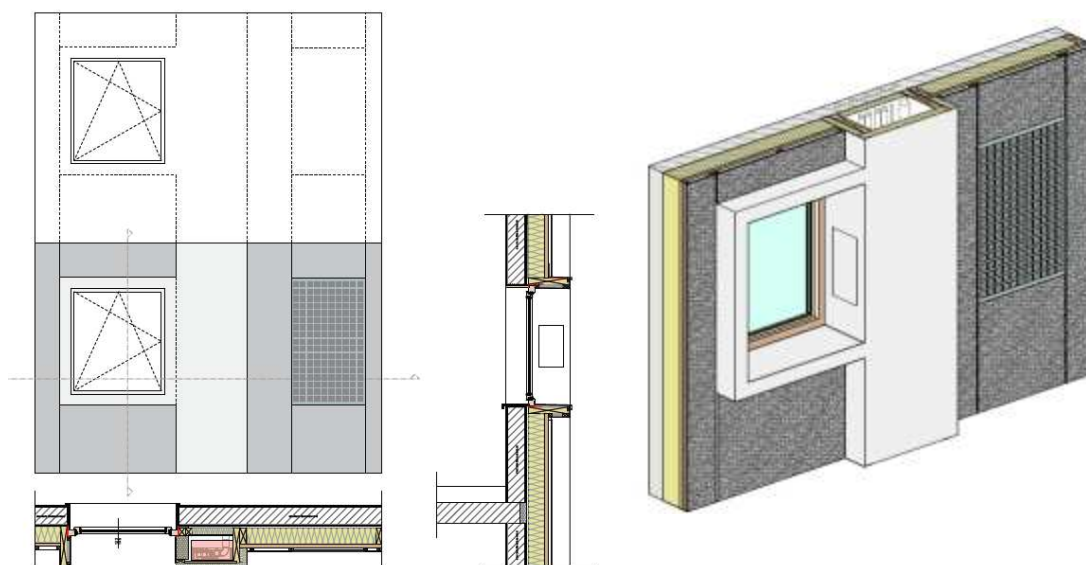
Schematic representation of a curtain wall façade element built up from separate elements
